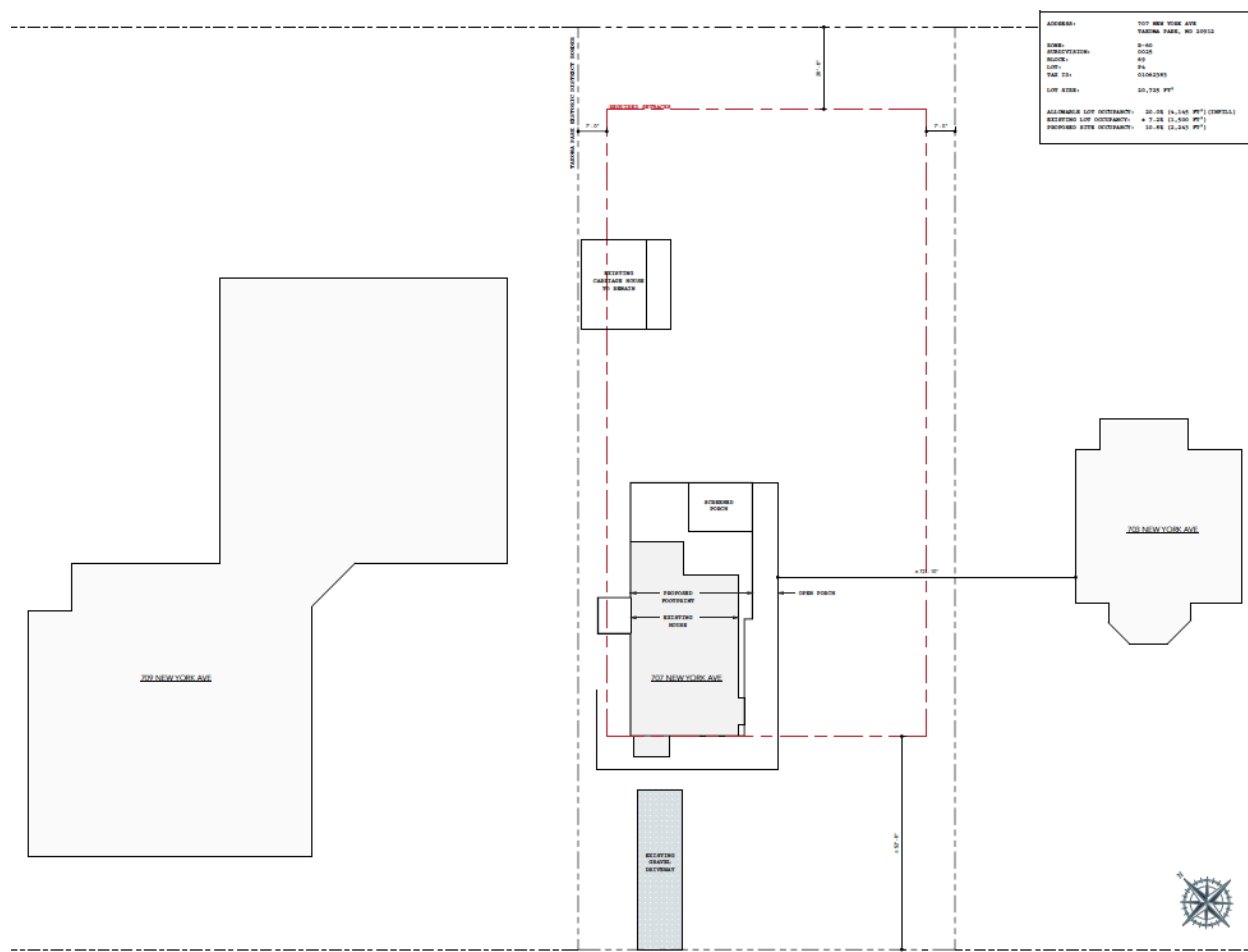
Proposed site plan showing the existing and proposed building footprints.
